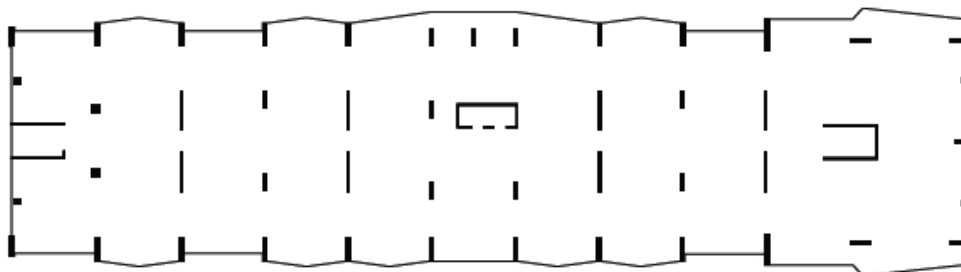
Structural Plan (Kesik & Saleff, 2009)
